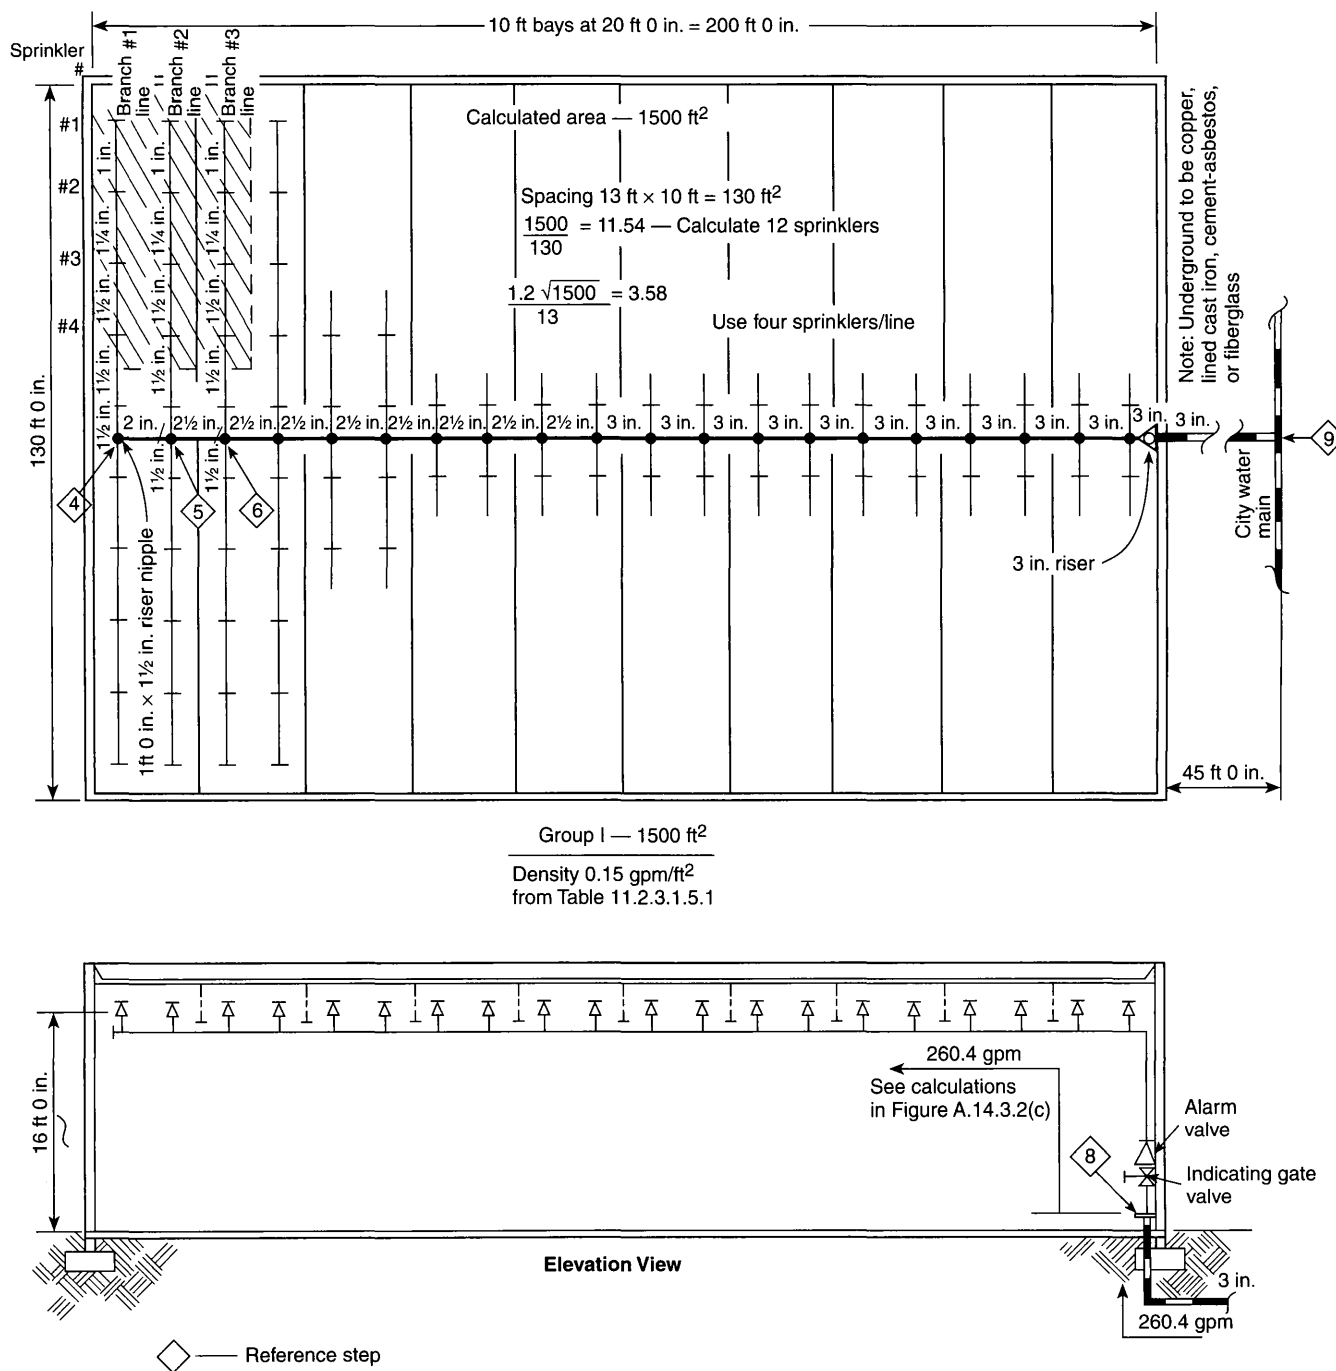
(b) Hydraulic Calculation Example (Plan View and Elevation View).
